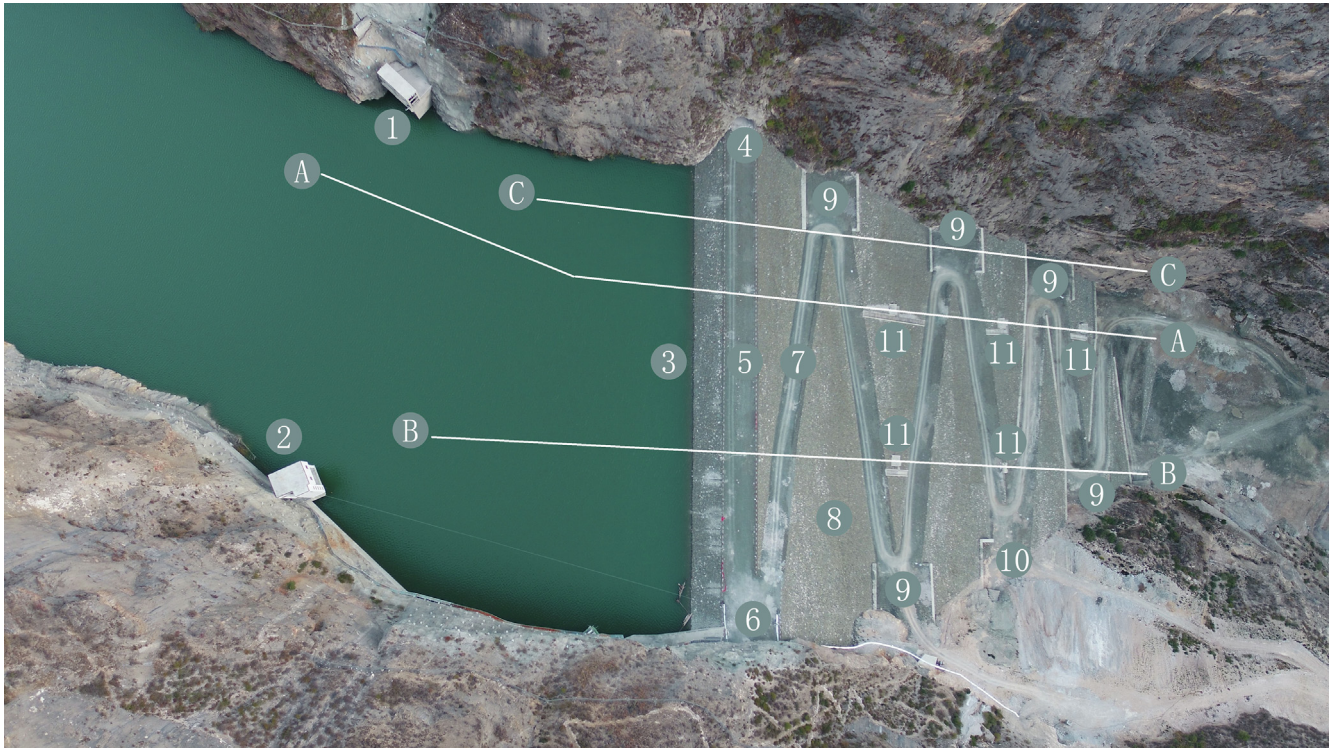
Overview of the Quxue Dam and locations of instrumented cross-sections A, B and C. (1) inlet of hydropower tunnel; (2) inlet of spillway tunnel; (3) water level at el.2327 m.asl., which is 3 m below the NWL at el.2330 m.asl.; (4) exit and entrance of transportation tunnel at left dam crest; (5) 15 m-wide dam crest at el. 2334.2 m.asl.; (6) exit and entrance of transportation tunnel at right dam crest; (7) 10 m-wide road berms; (8) downstream slope 1 V:1.3H between road berms (average slope 1 V:1.84H); (9) platforms for vehicles' "U" turn; (10) exit and entrance of transportation tunnel and platform for vehicles' "U" turn; (11) observation huts.
